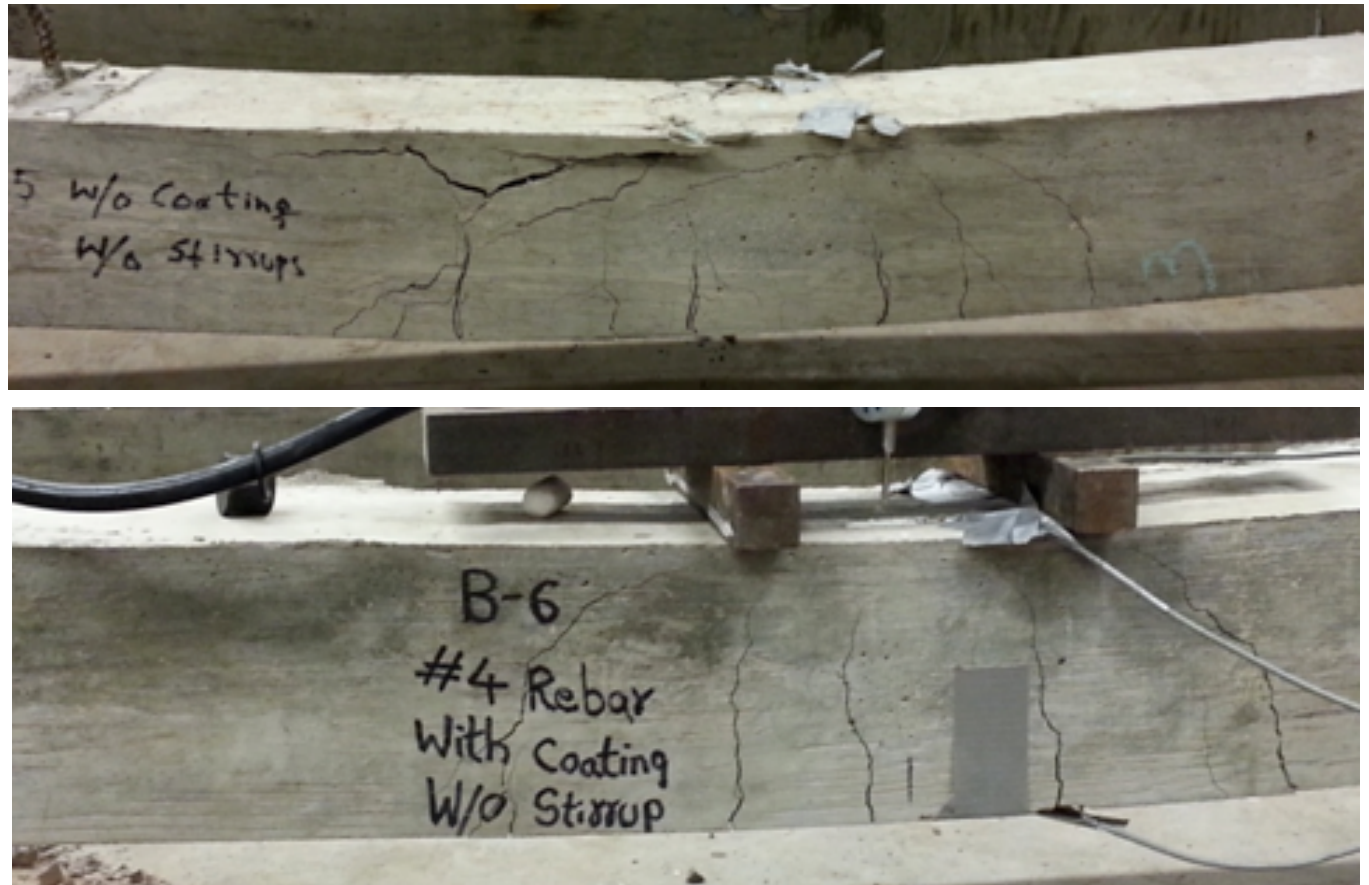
Beams from #4 Rebar without and with coating; and without stirrups.
